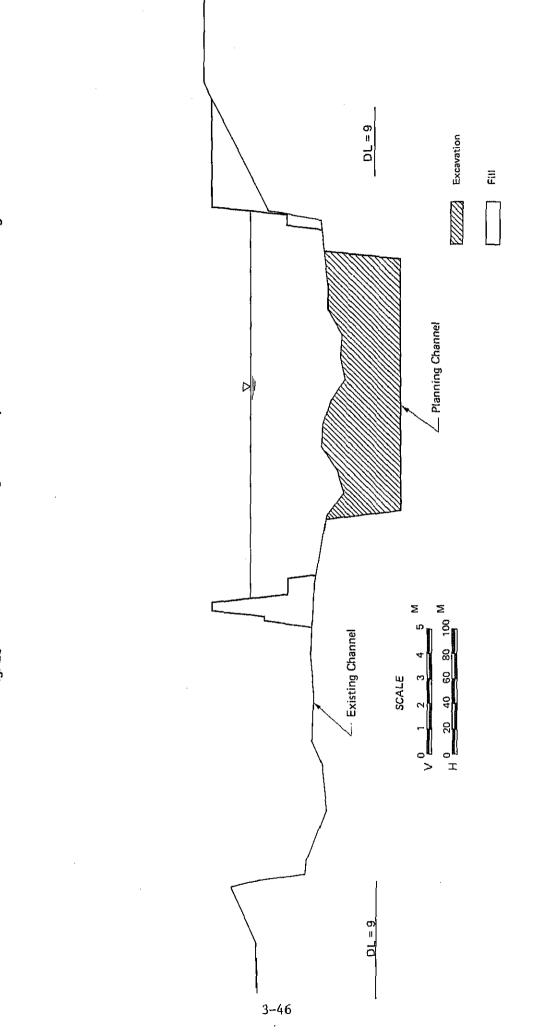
Cross Section of K. Progo River Improvement at Surandakan Bridge
